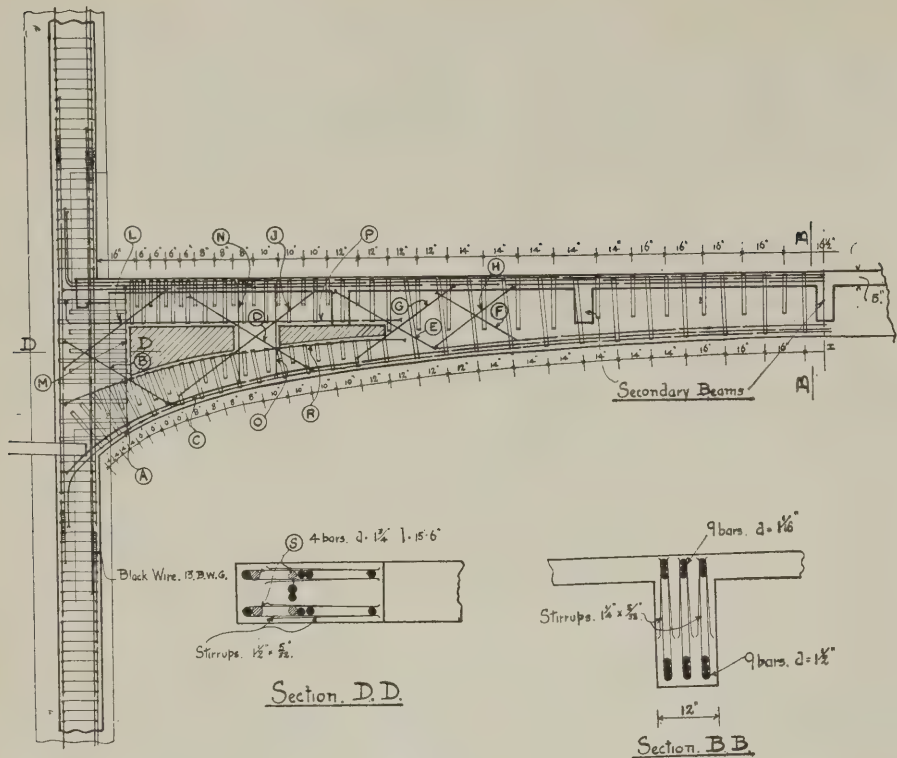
TYPICAL DETAIL OF ARCHED BEAMS, GROUND FLOOR.
